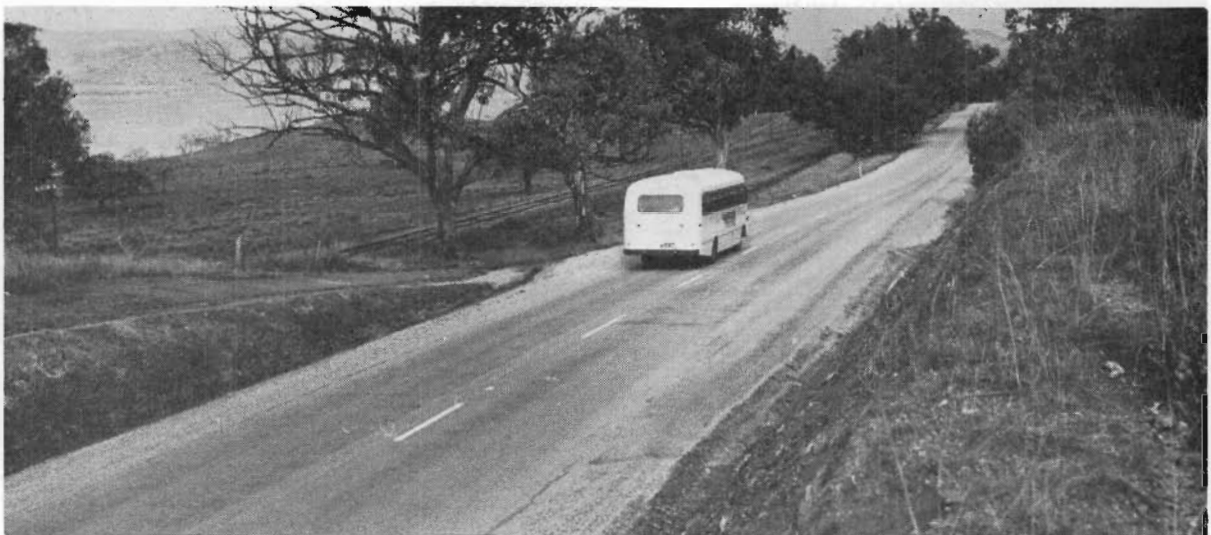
Murray Valley Highway Section I. Reconstructed and sealed section near Ebden. Wodonga Shire.
